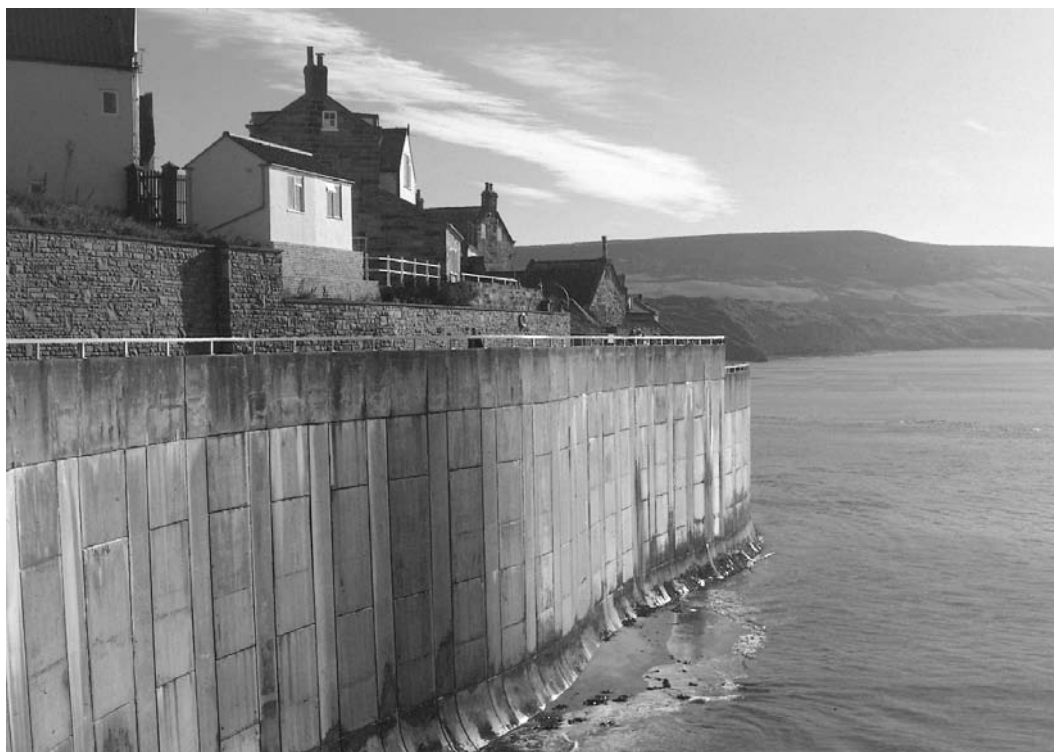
Concrete vertical seawall, Robin Hoods Bay, North Yorkshire (courtesy of HR Wallingford)
